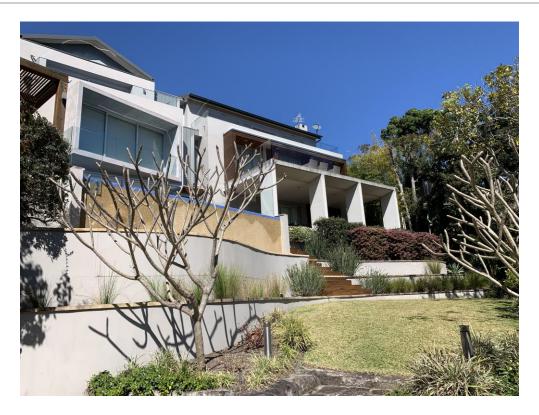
View of the northern elevation of the existing dwelling, looking south-east from the entry driveway from Mitchell Road
